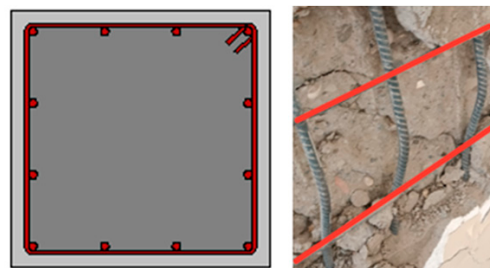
The column cross-section and an example transverse reinforcement spacing.
